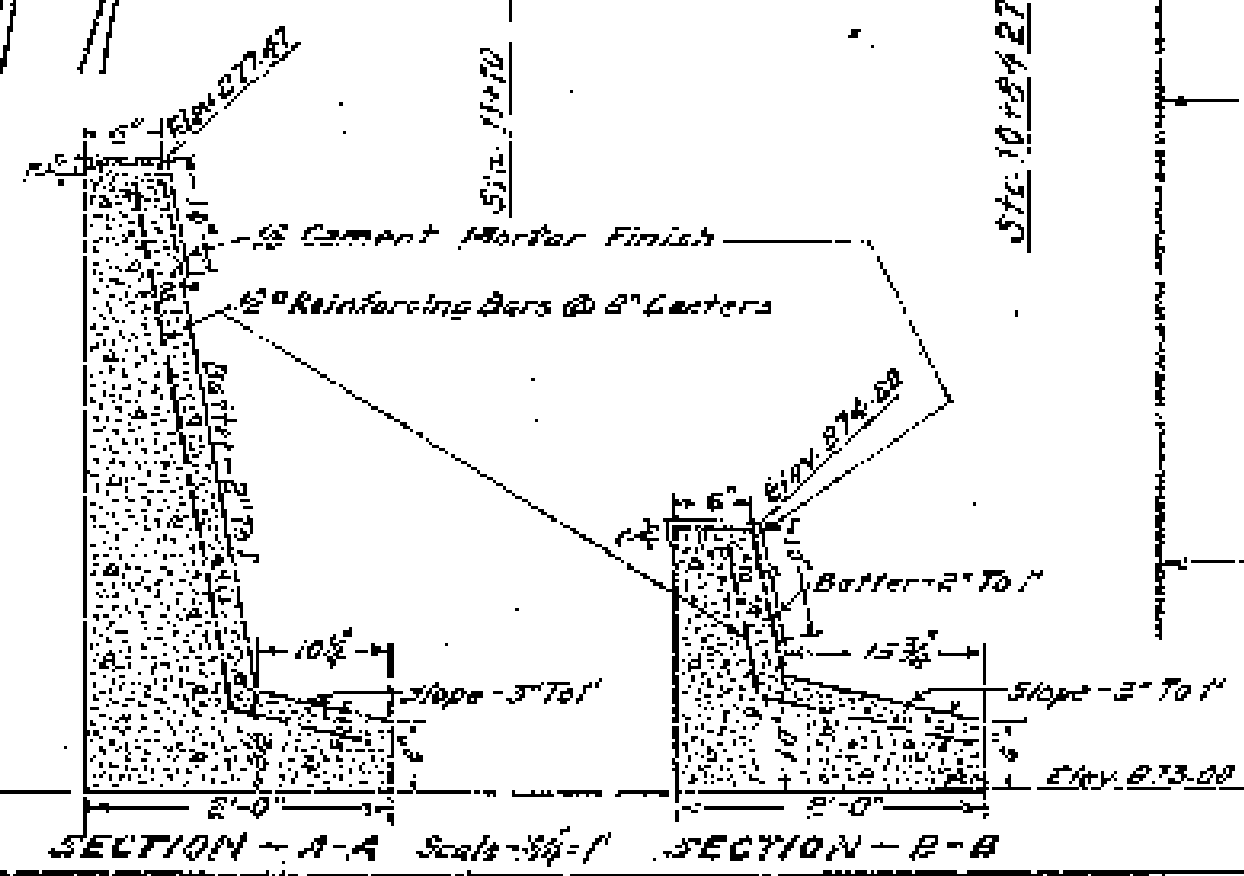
DETAILS OF CONSTRUCTION BETWEEN OLIVE STREET AND VINE STREET
